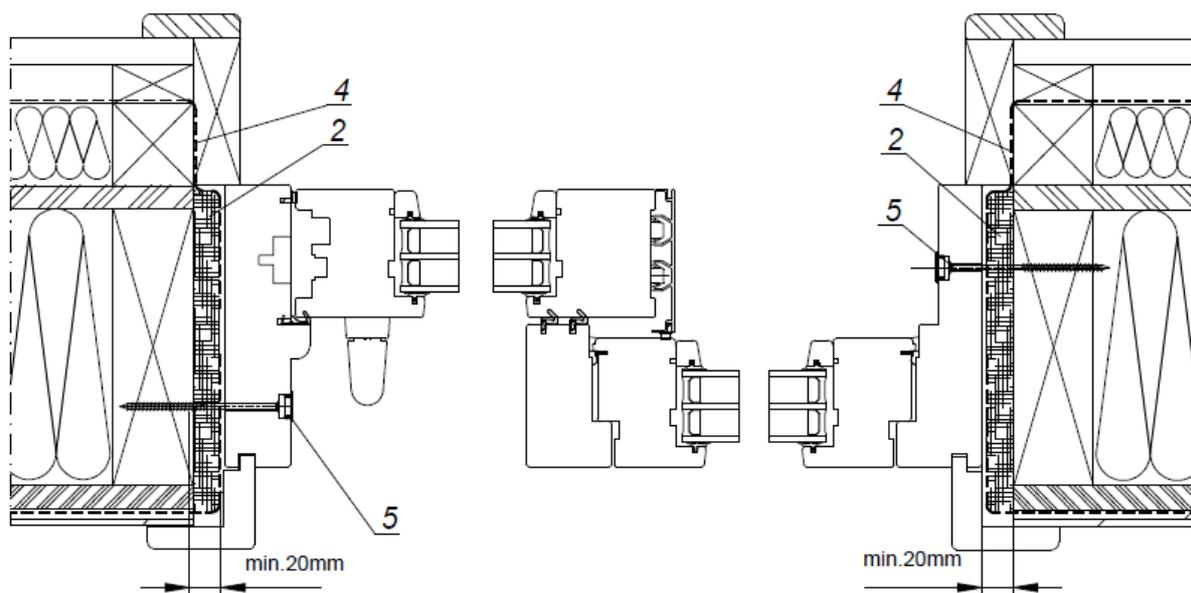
Example of installing the ECO-SLIDE in a modular wooden wall
